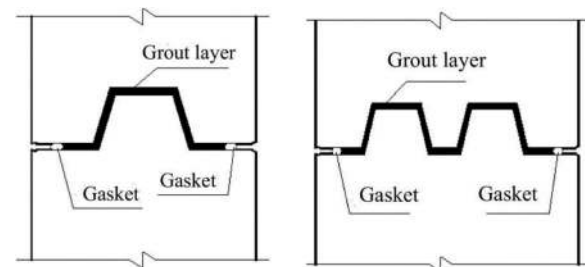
Structure of grouted mortise-tenon joint (single tenon and double tenon).
